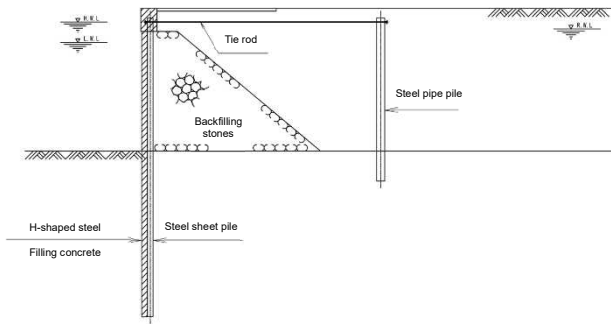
Example of a construction method that reinforces sheet piles (S-14)
